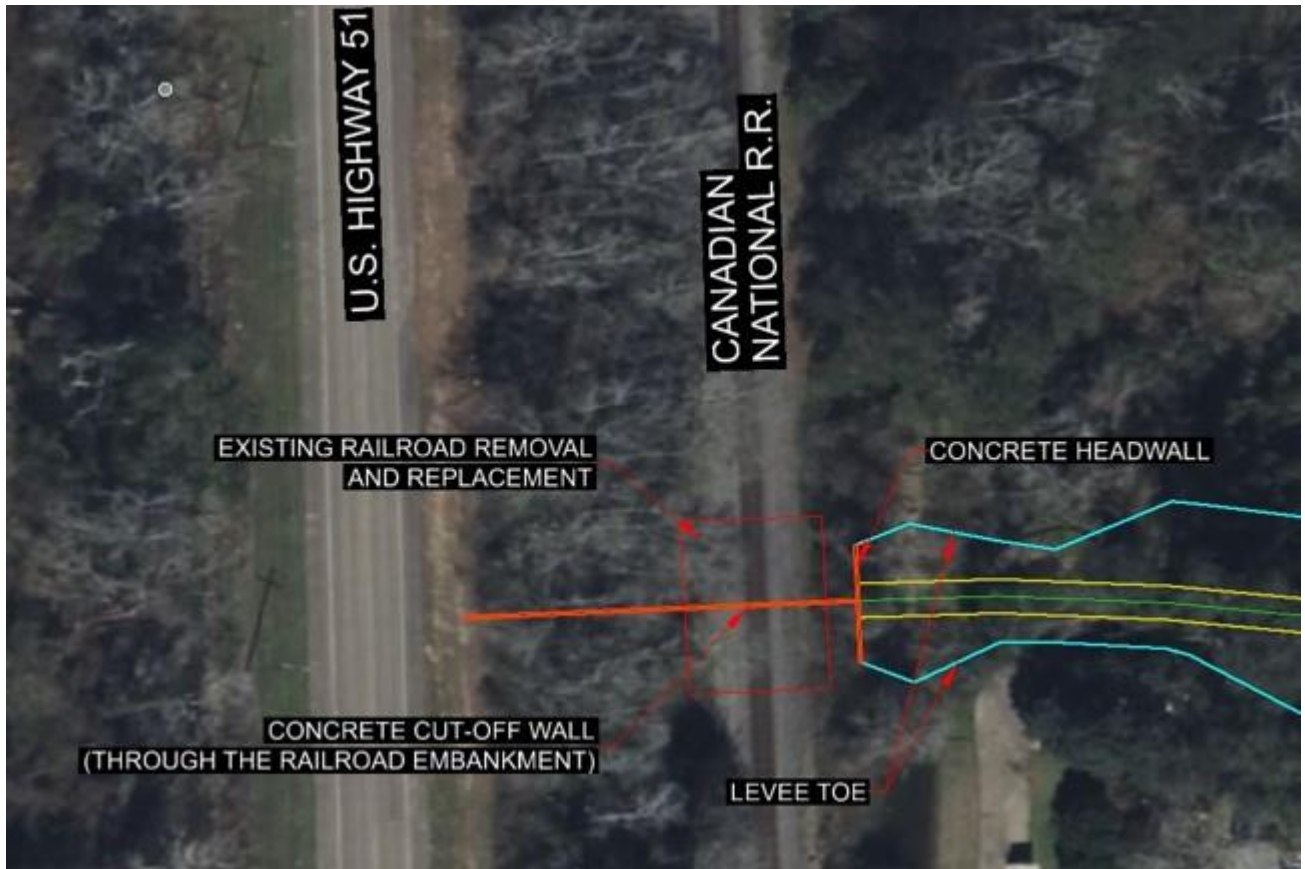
Concrete Cutoff Wall Through Canadian National Railway Embankment
